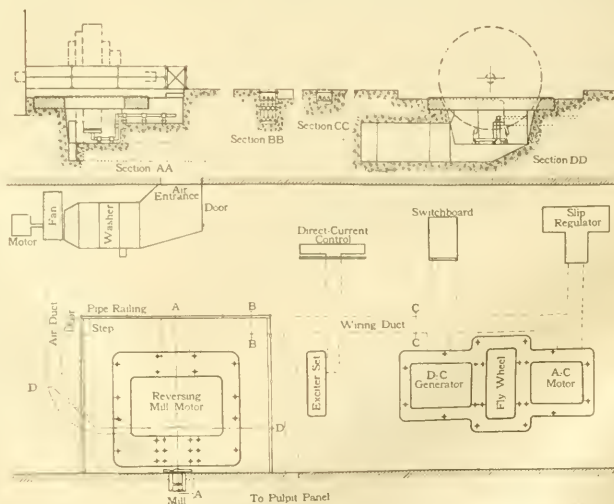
FLOOR PLAN FOR SINGLE UNIT REVERSING MILL MOTOR SUBSTATION
